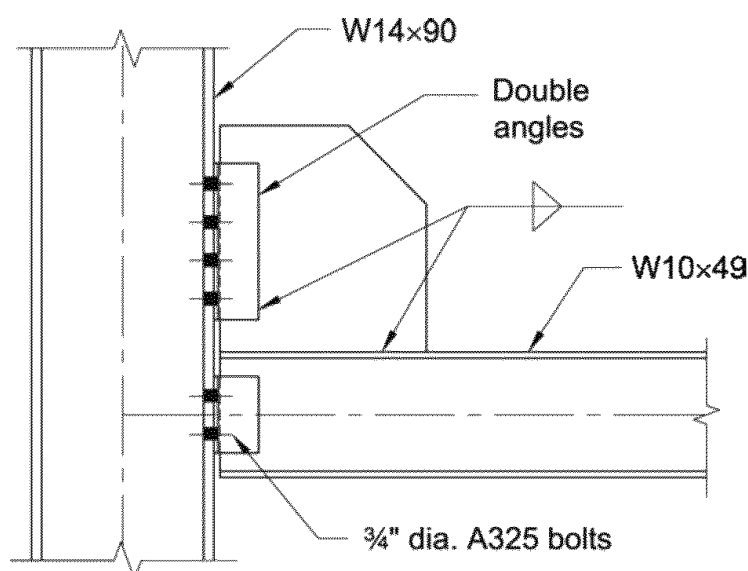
Beam-to-column connection that allows rotation (Stoakes and Fahnestock, 2010).
